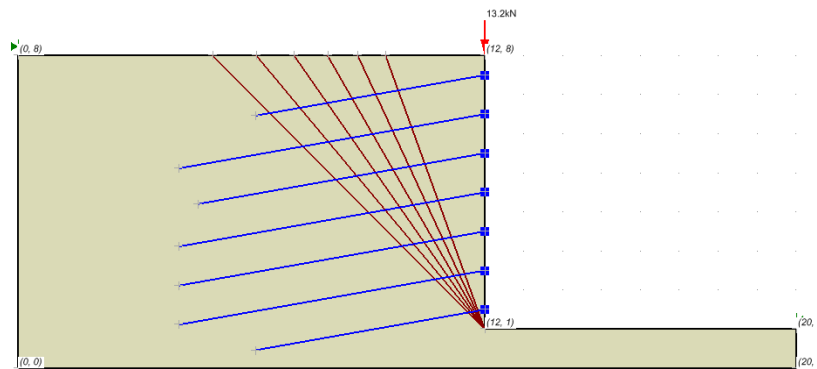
Geometry of the Sheahan Clouterre Test Wall model
